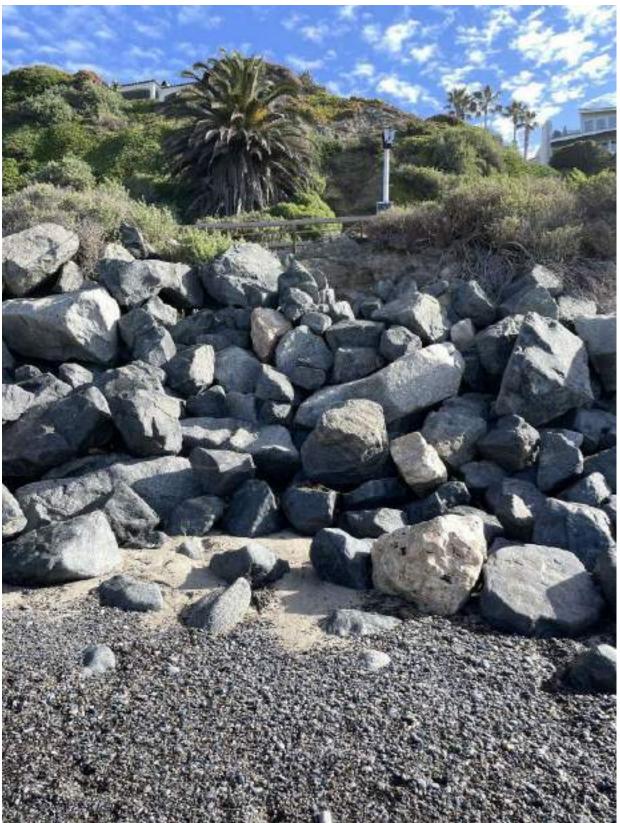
Undersized stones, exposed ballast and no crest protection at culvert outfall
